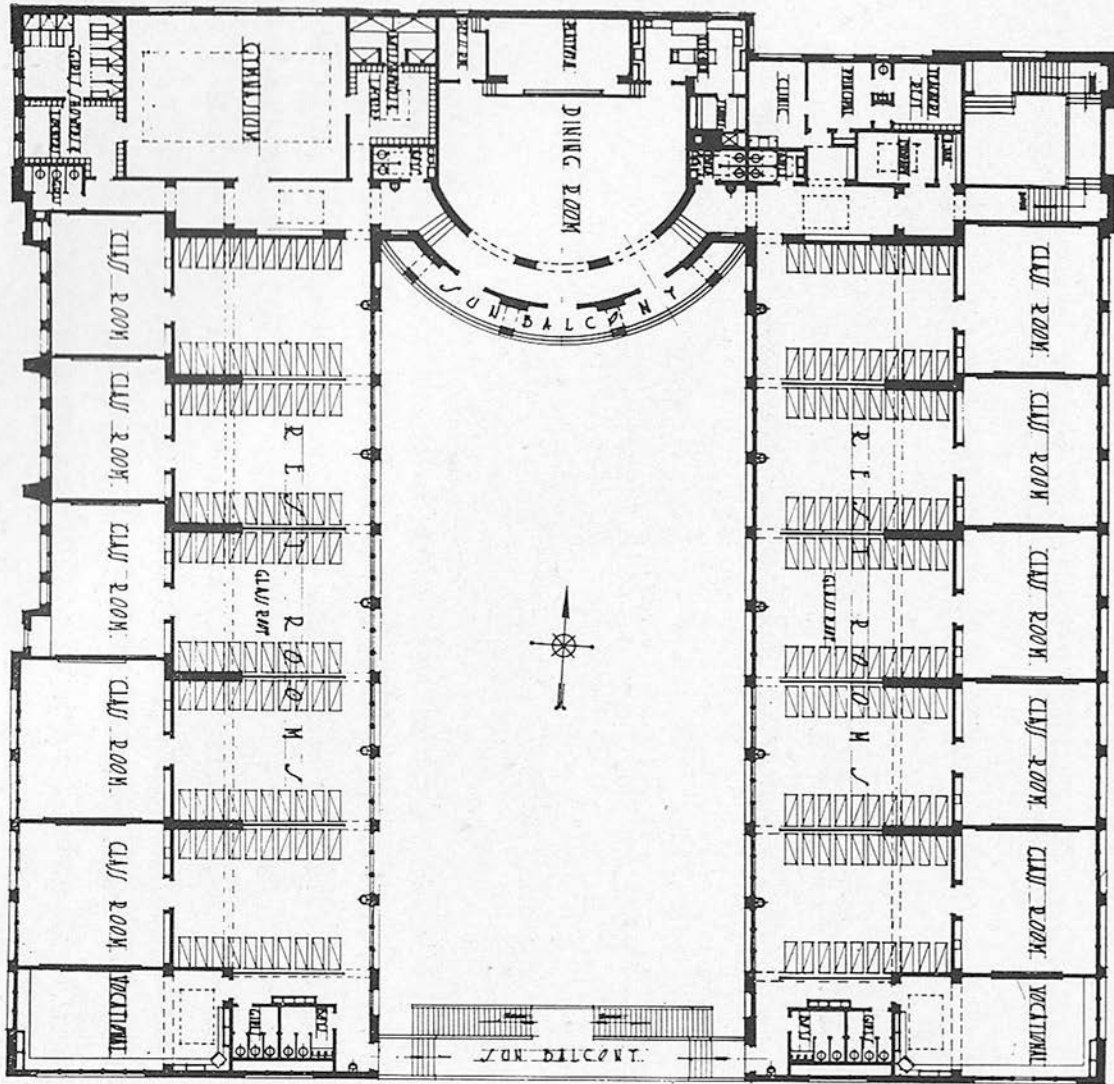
Second floor plan of the former Sunshine School; north is up.
